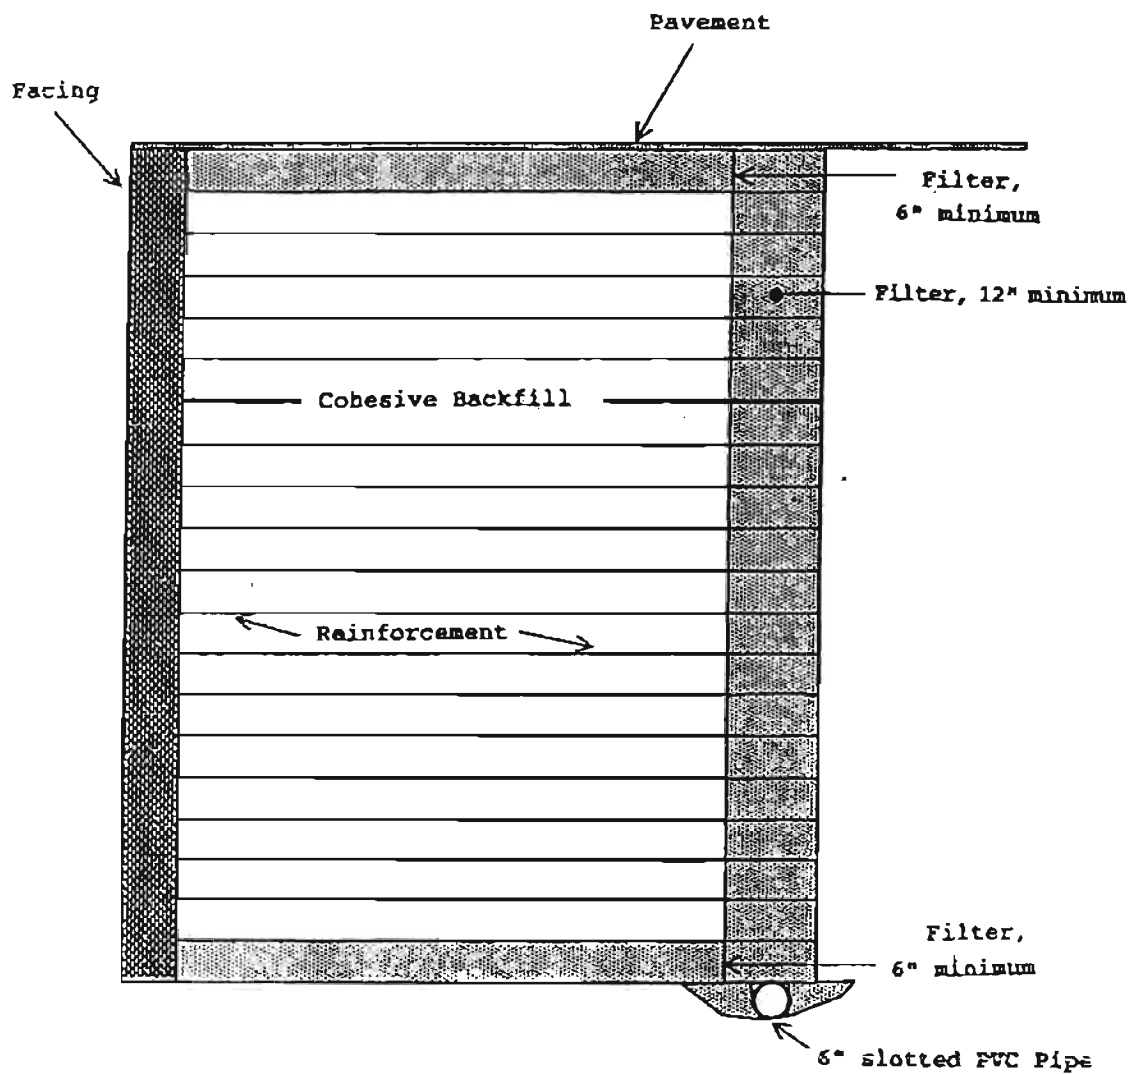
Recommended Subsurface Drainage Design for Cohesive Backfill Walls
